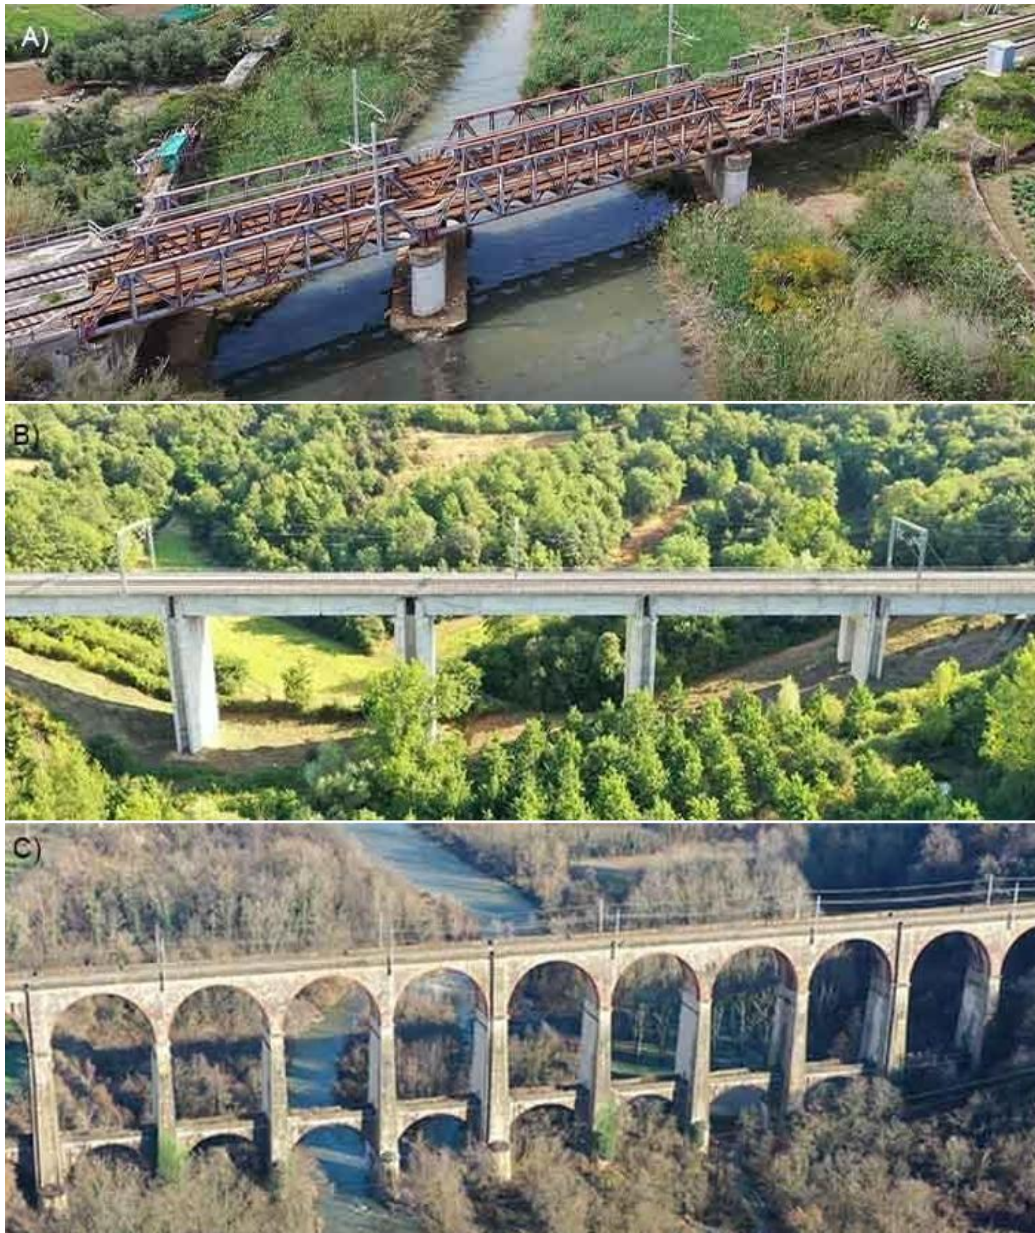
Examples of different types of bridges found on the Italian Railway Network: a) truss metallic deck with masonry substructures, b) viaduct with pre-stressed reinforced concrete deck and reinforced concrete substructures, c) masonry arch bridge
